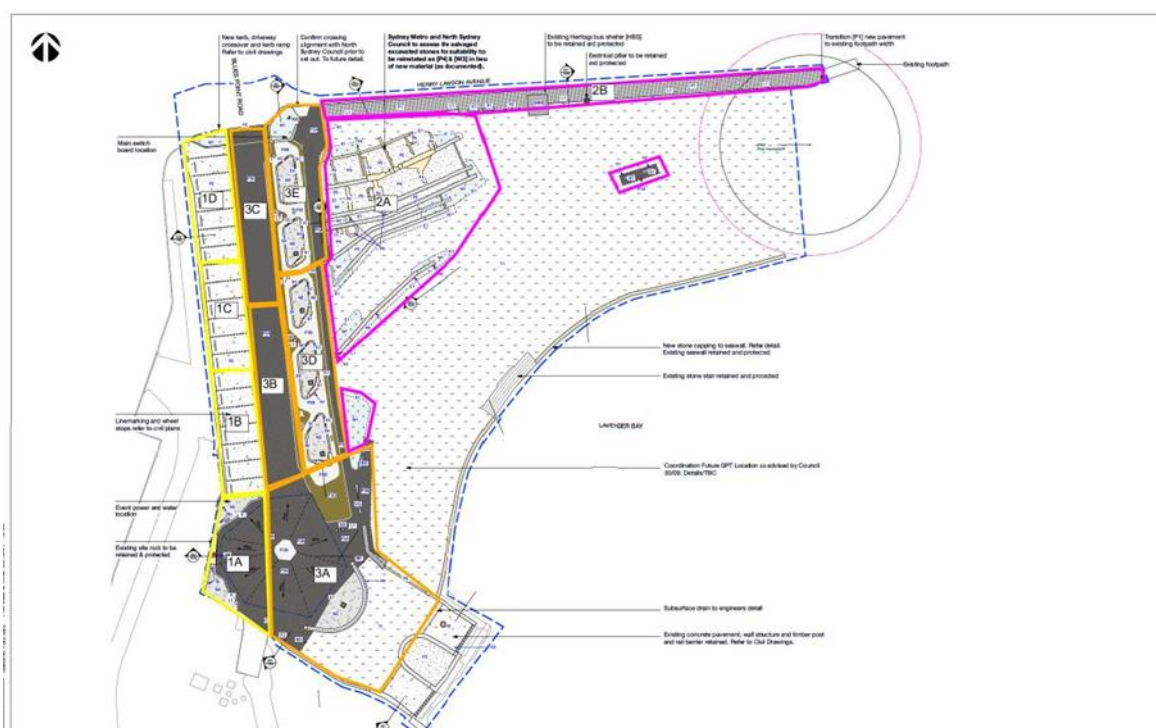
Study area showing detailed work zones as allocated by Systems Connect.
